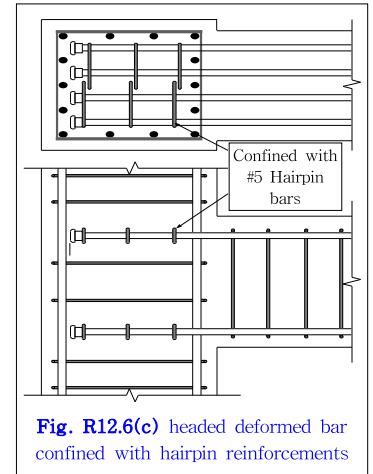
(c) headed deformed bar confined with hairpin reinforcements
